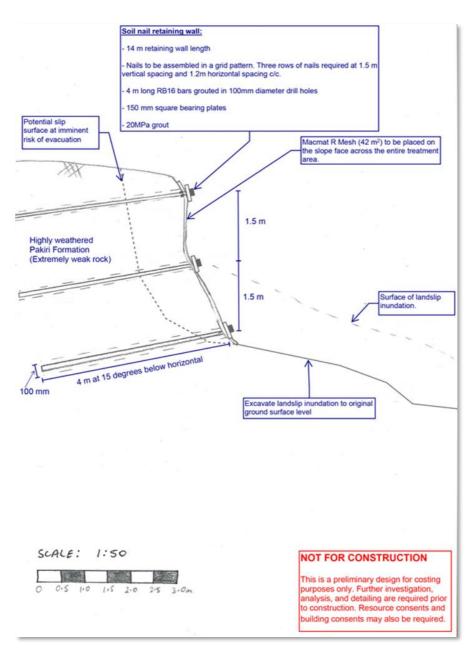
Key design elements of a nail/anchor retaining wall sketch
